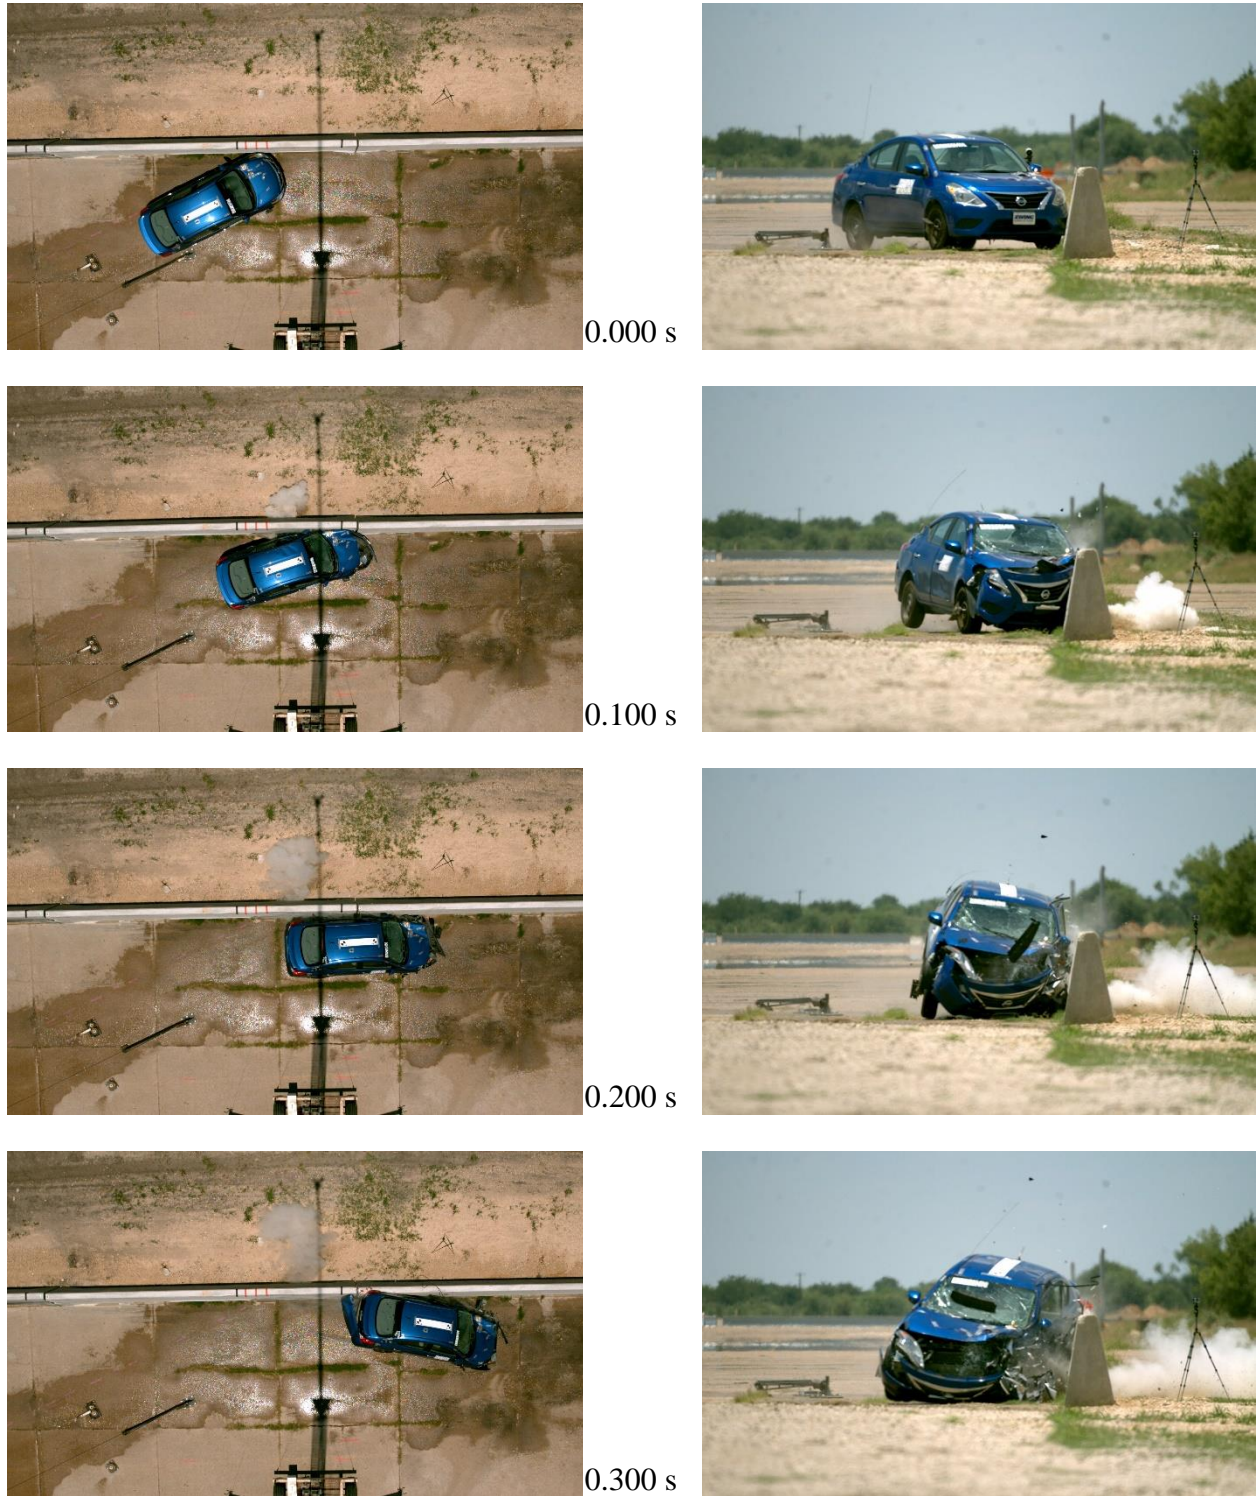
Sequential Photographs for Test No. 469760-06-1 (Overhead and Frontal Views).
